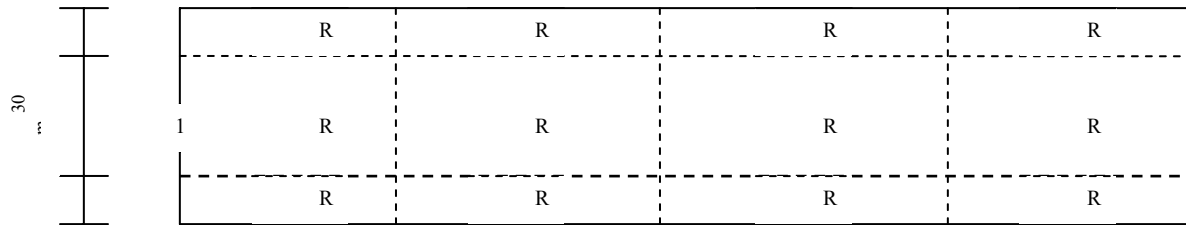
Example Runway (RW 15R-33L) Division into Sections.
